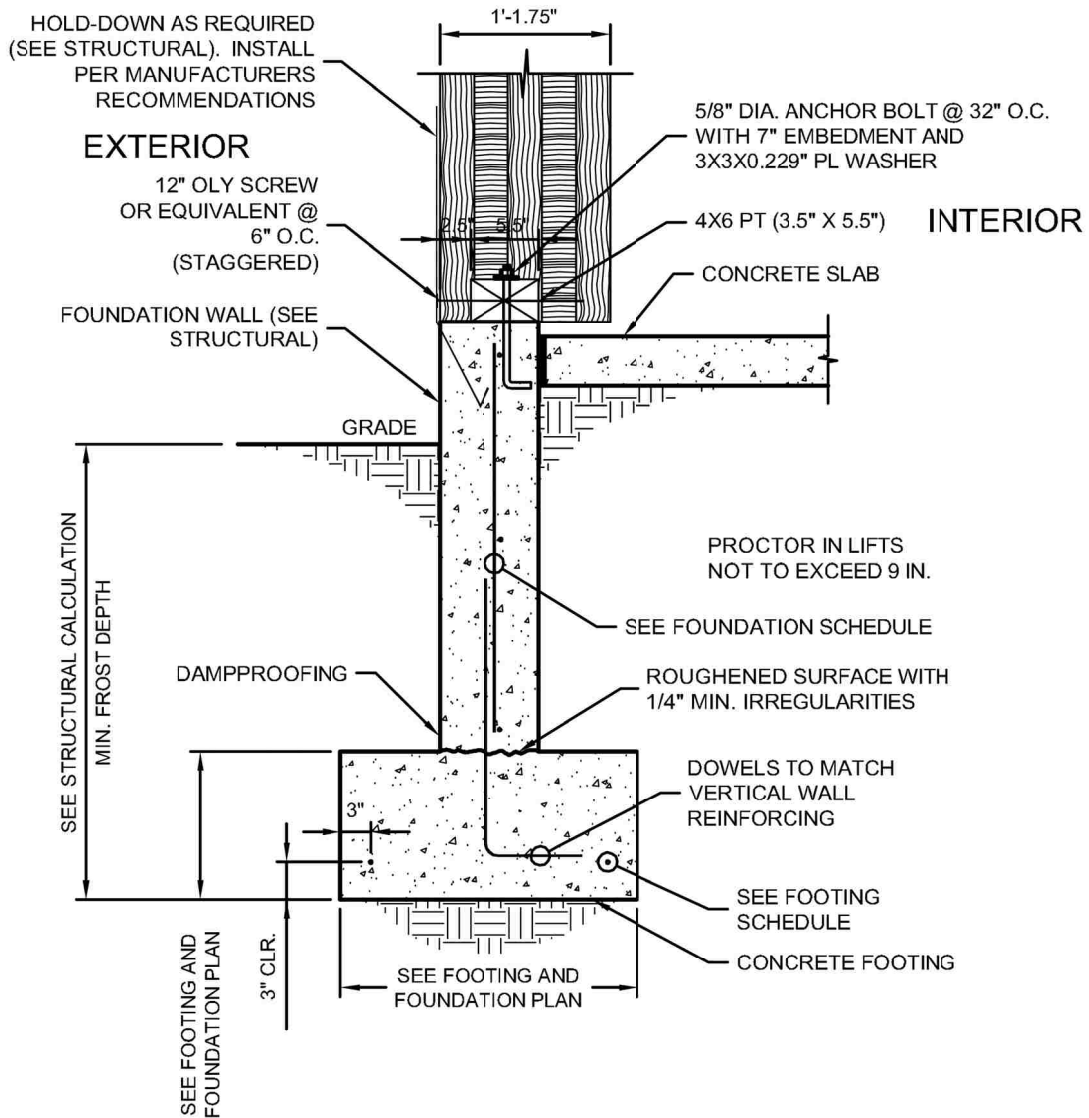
ICLT Wall to Foundation Connection (Acute Engineering 2011)
